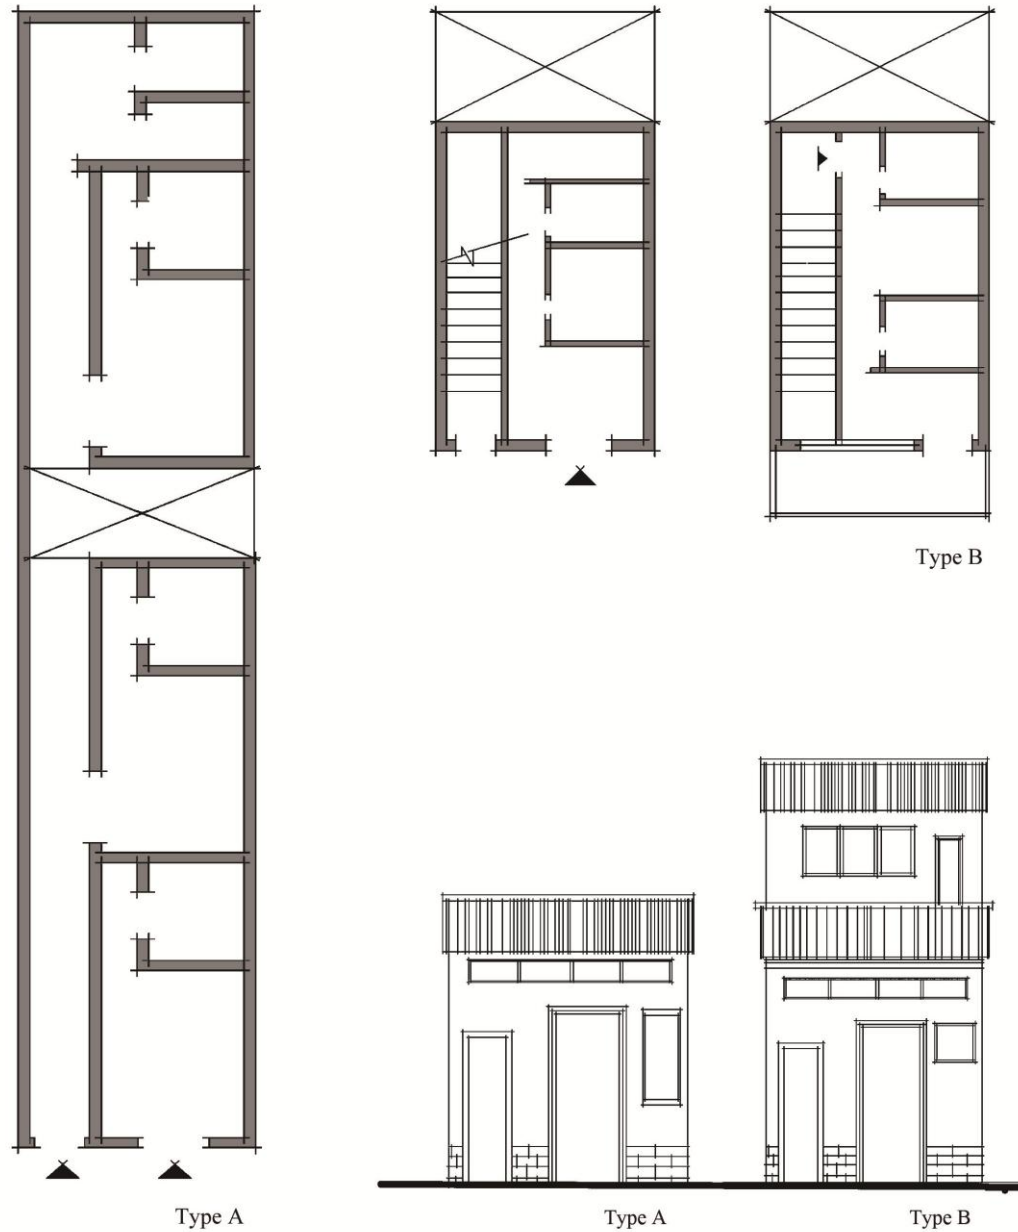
Floor plans and façades of two types of *multi-family zhutongwu
